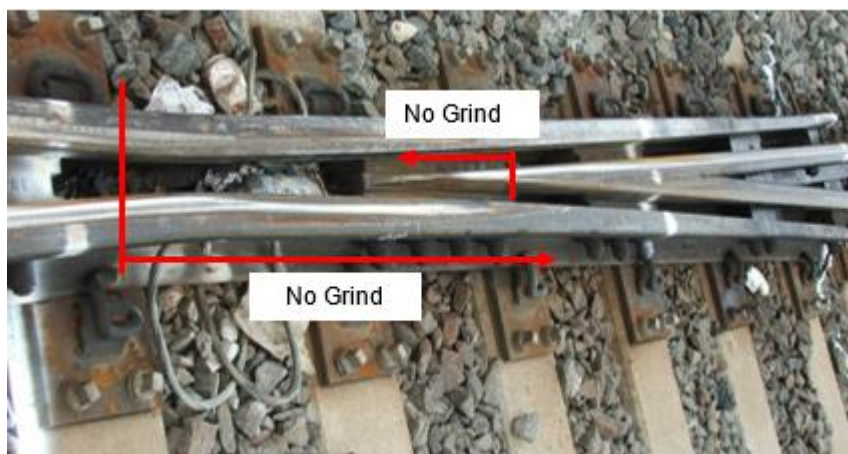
Regions in worn crossing that should not be ground with grinding machine
